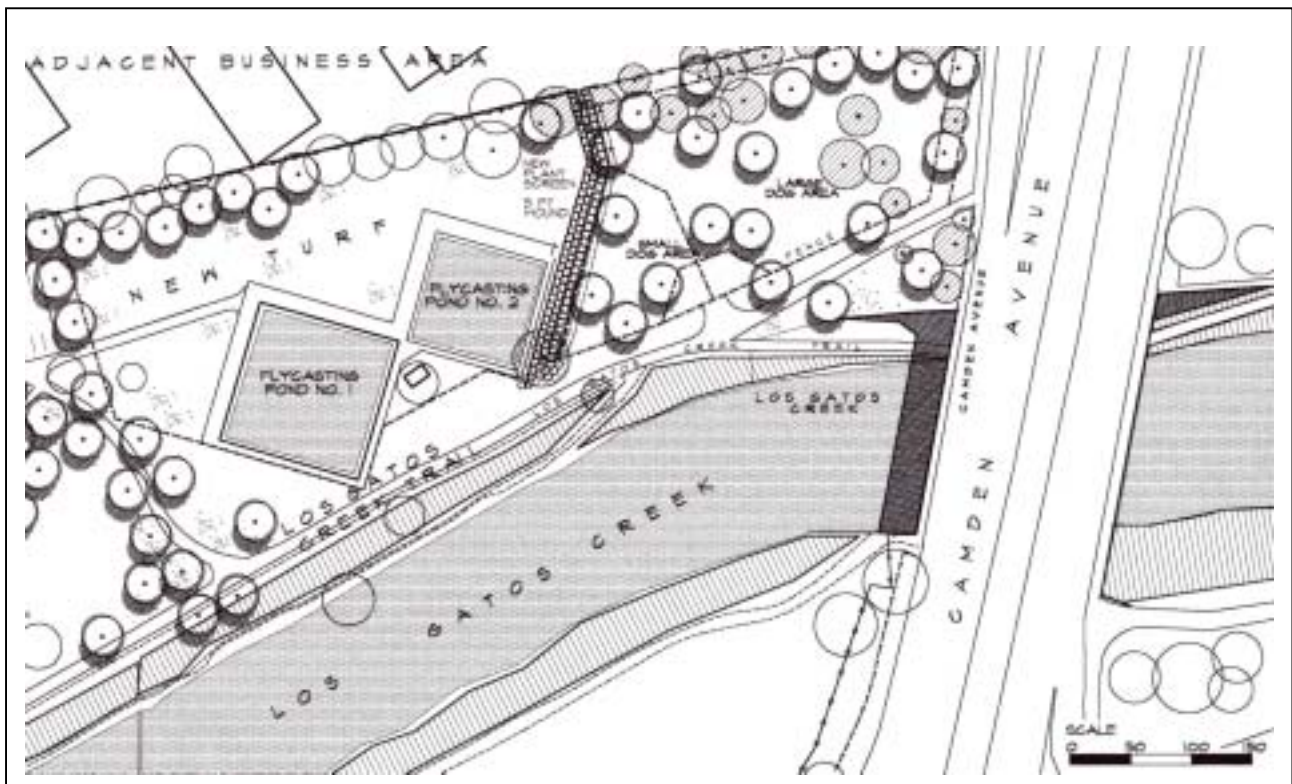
Detail Plan – Zone 1 Active Recreation Zone – Part B
